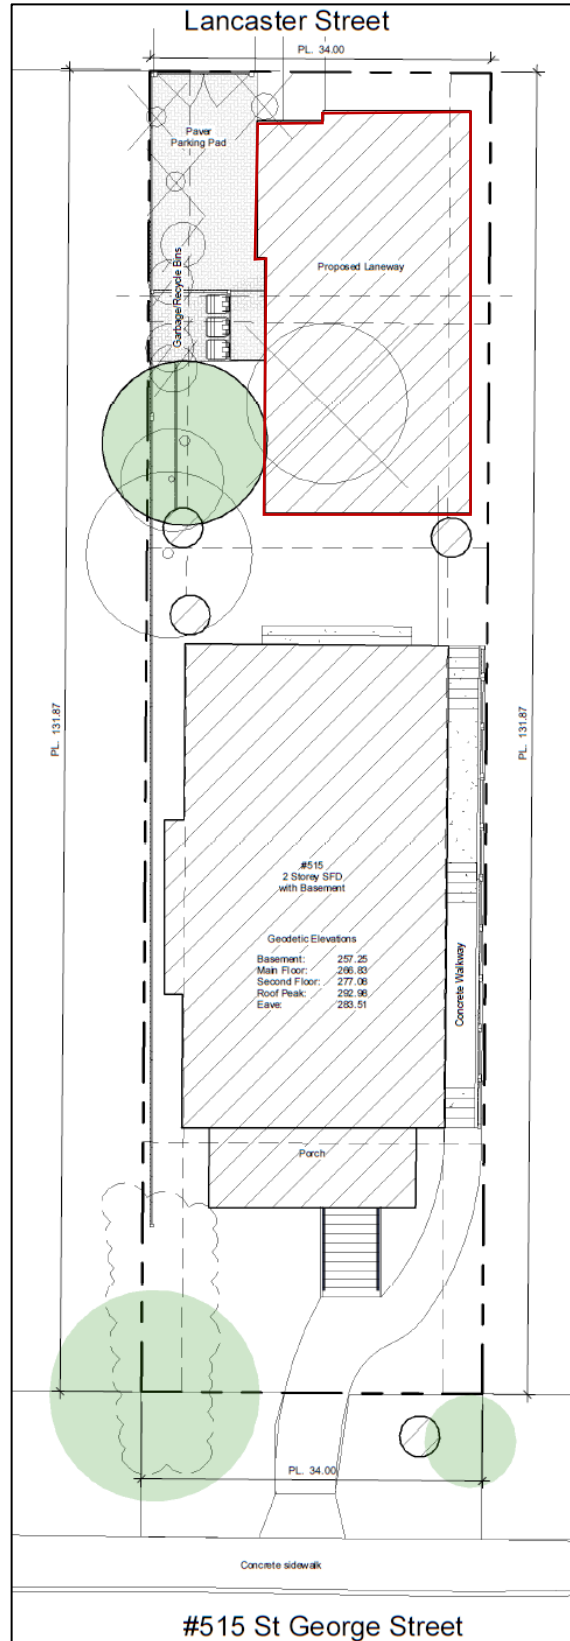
Site Plan of the proposed development at 515 St George Street with the preservation of Adams House in-situ and the construction of a Laneway House at the back of the property, outlined in red at the top of the plan. (Source: D3 Design)
